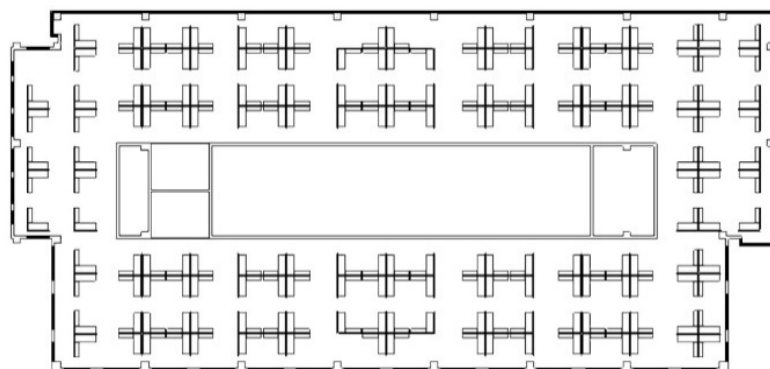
Layout #1: Desks Perpendicular to Windows-Bridge Layout
